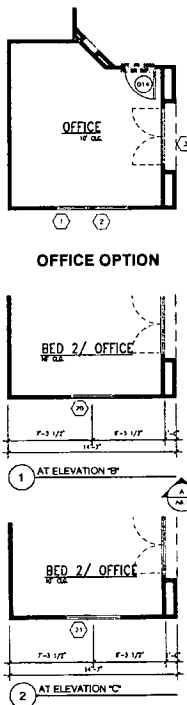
Plan 242 Floor Plans, Elevations (A), (B), & (C)
